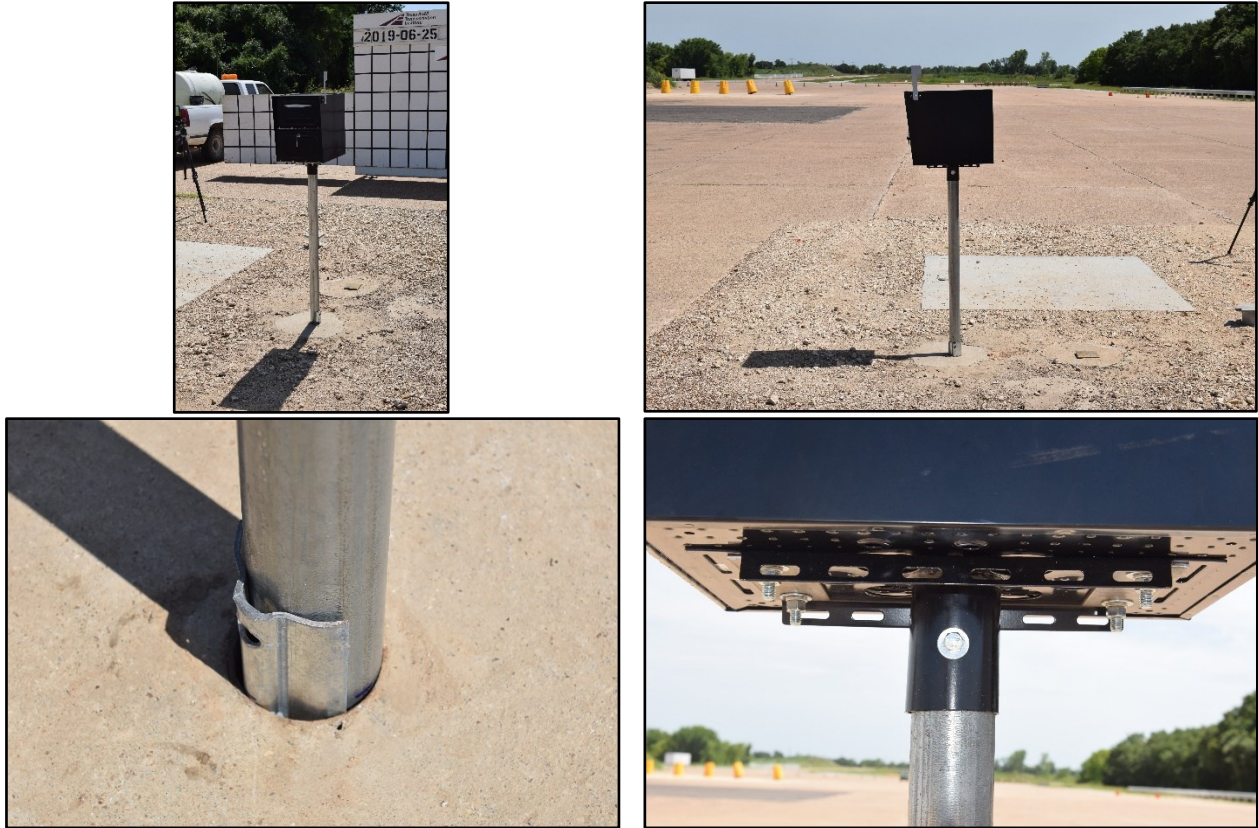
presents overall information on the lockable mailbox on thin-wall galvanized tube with Type 2 foundation, and Figure 11.19 provides photographs of the test installation. Further details are provided in Appendix J.3.1.
